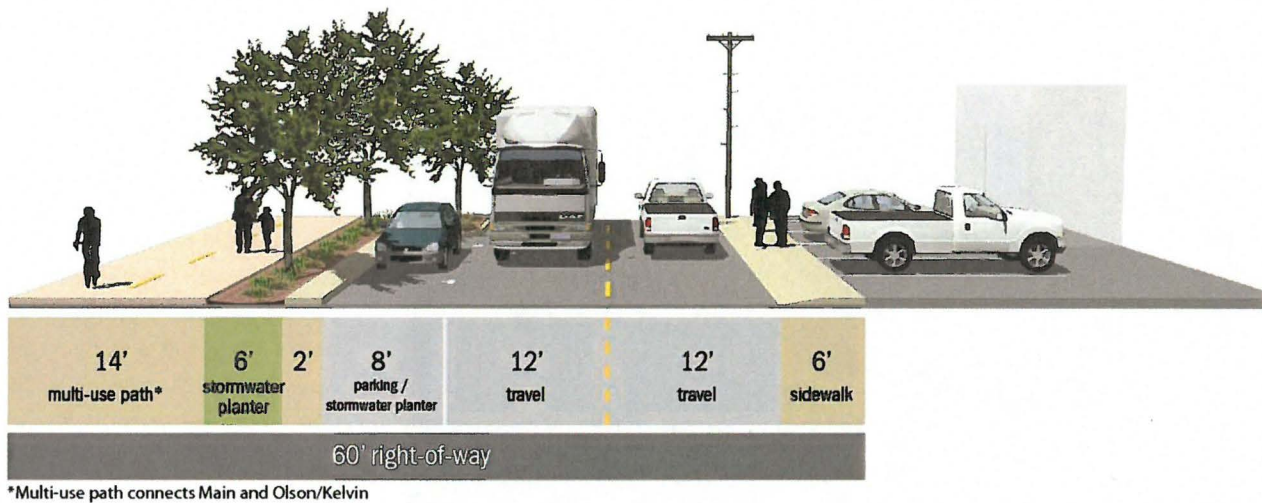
CONCEPTUAL CROSS-SECTION FOR STUBB ST WITH CONTINUOUS ACCESS (LOOKING EAST)
